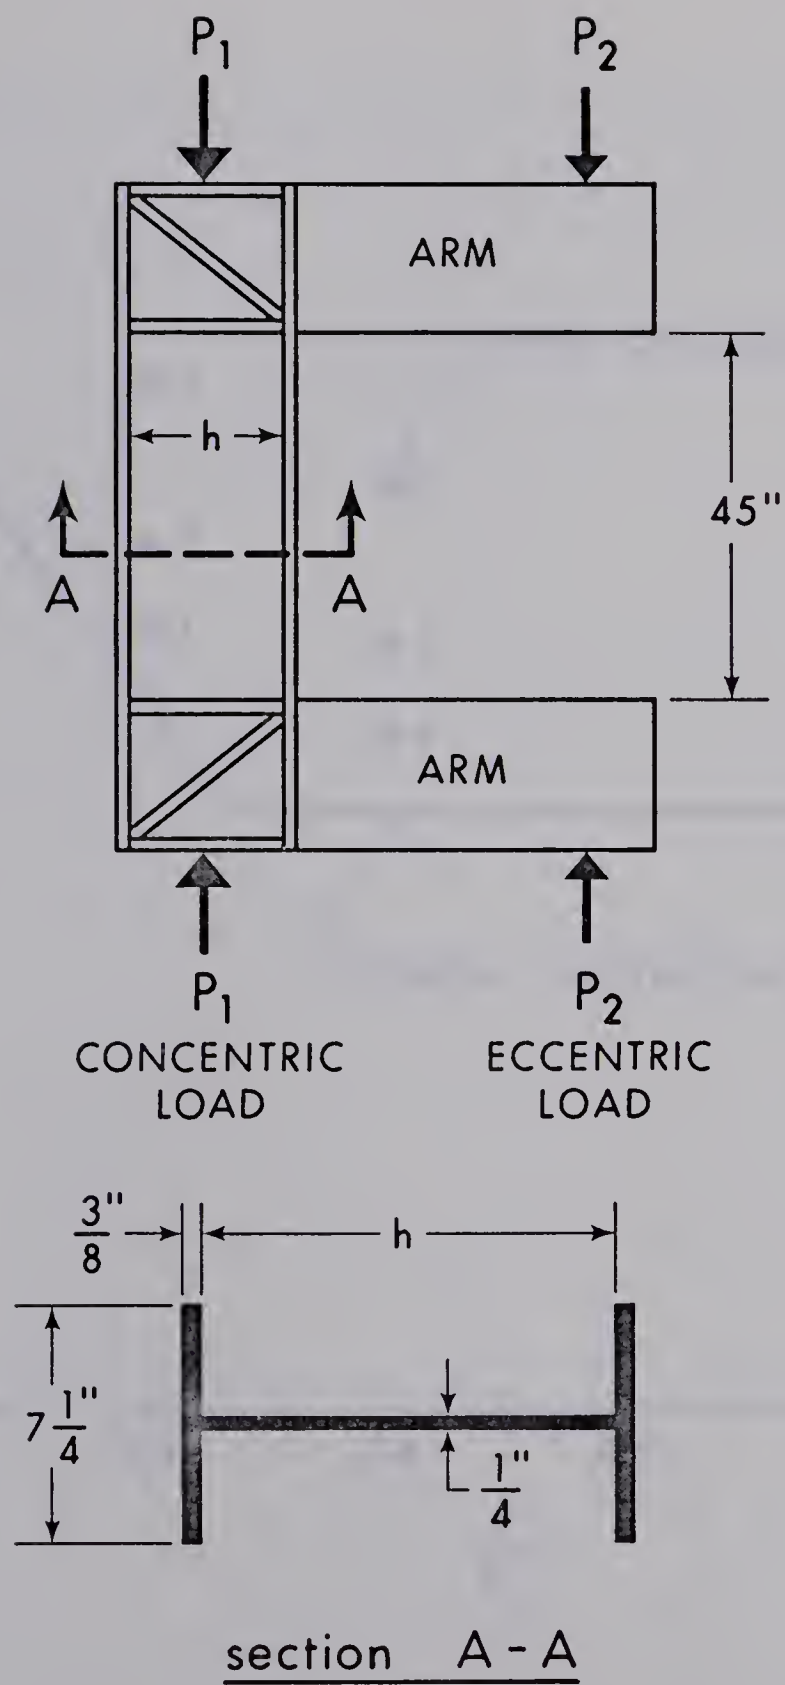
DETAILS OF BEAM-COLUMN TEST SPECIMENS
